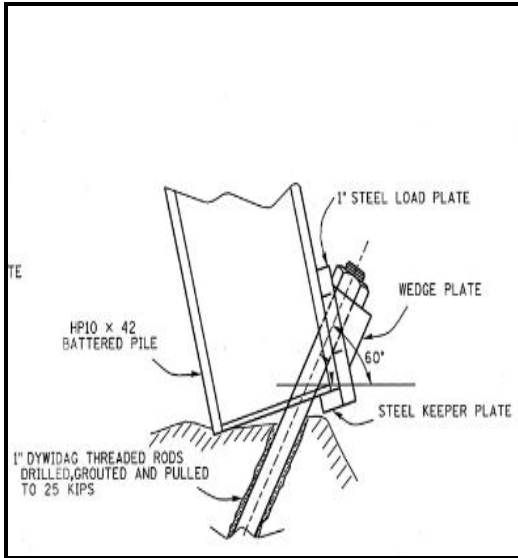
Pile Anchorage Detail (TDOT Design Drawing M483-392E)
